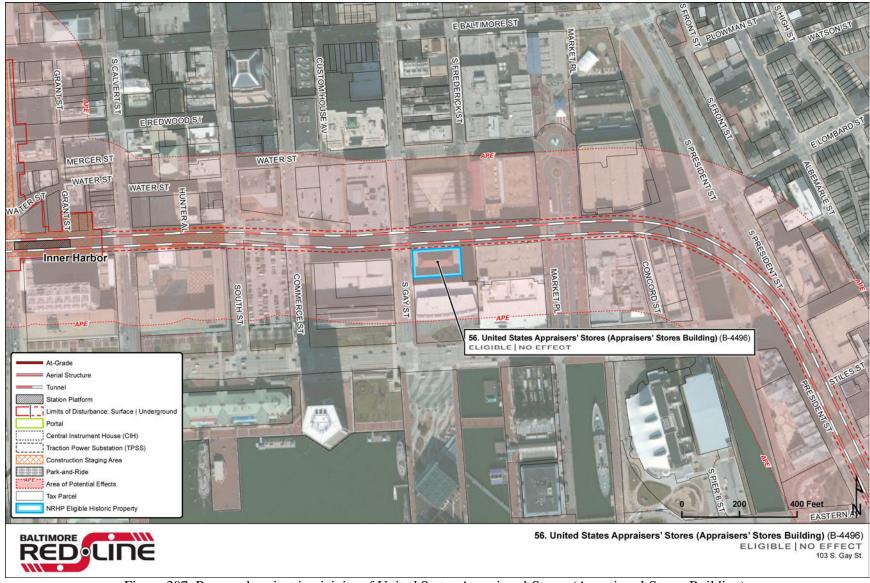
Proposed project in vicinity of United States Appraisers' Stores (Appraisers' Stores Building)
